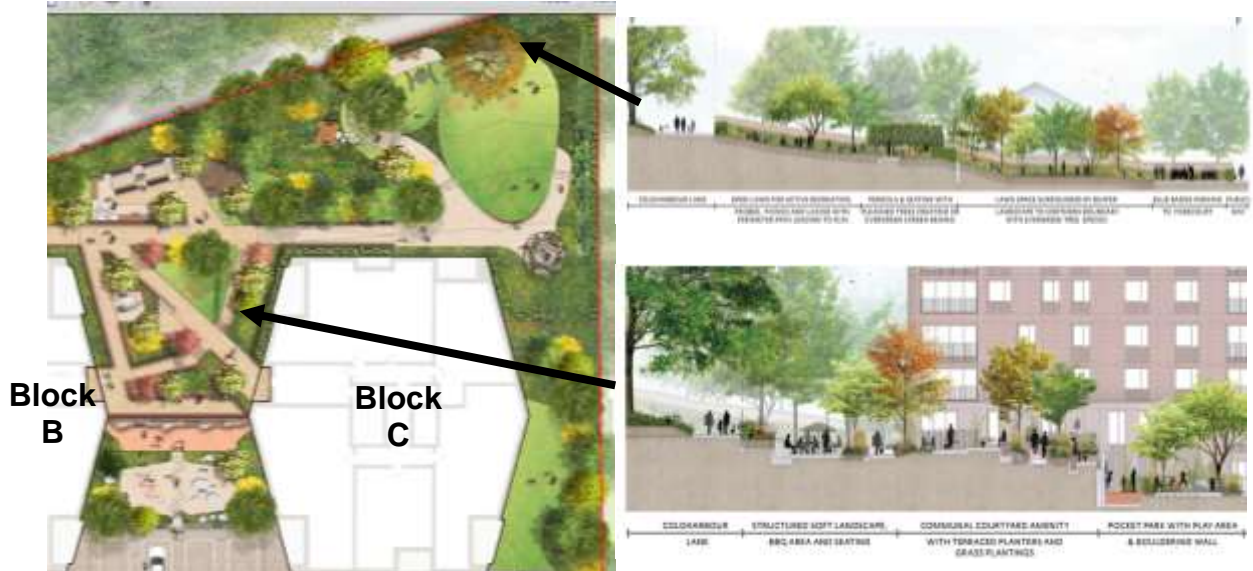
Proposed landscape masterplan between and to the rear of Blocks B and C (left) and section details between Block B and C (top right) and Block C and 920 Purley Way (bottom right)
